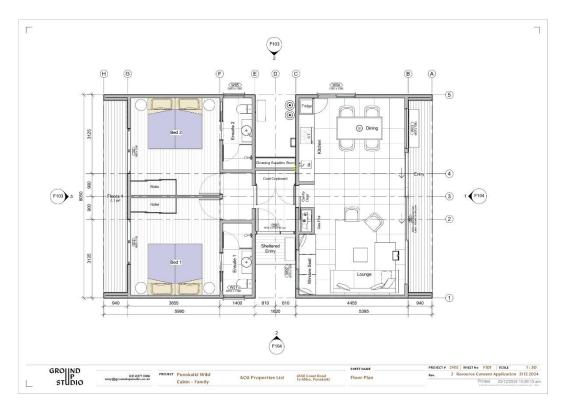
Family Cabin – Floor Plan (Ground Up Studio)
